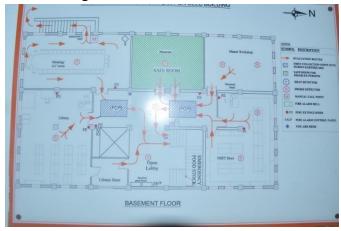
18: Basement Floor Plan with escape routes, collection points and other indications
